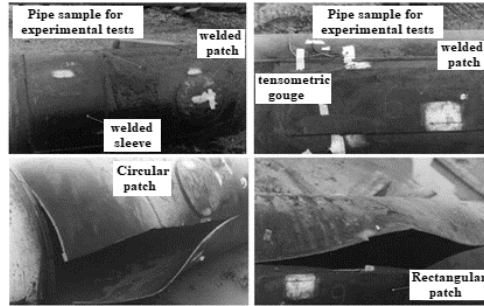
Pipe sample repaired by the application of Type B sleeve and patches subjected to internal pressure test until burst [2,5]
